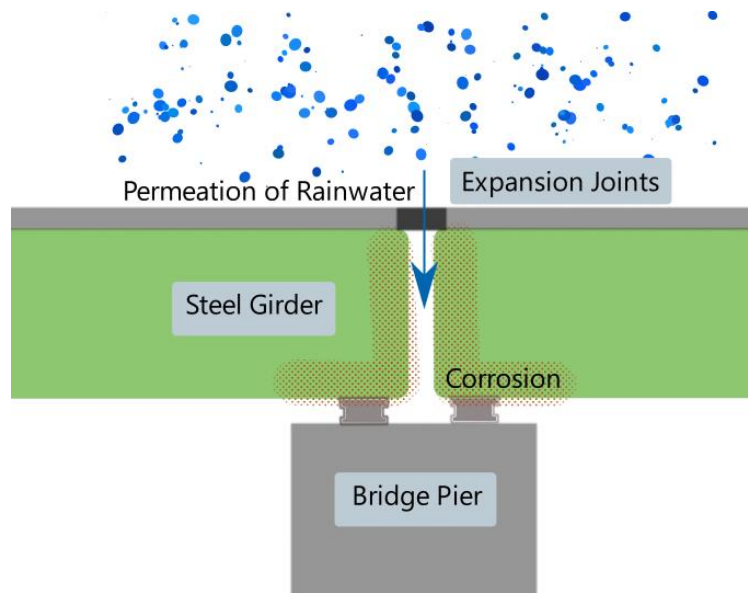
Steel girder expansion joint corrosion illustration
